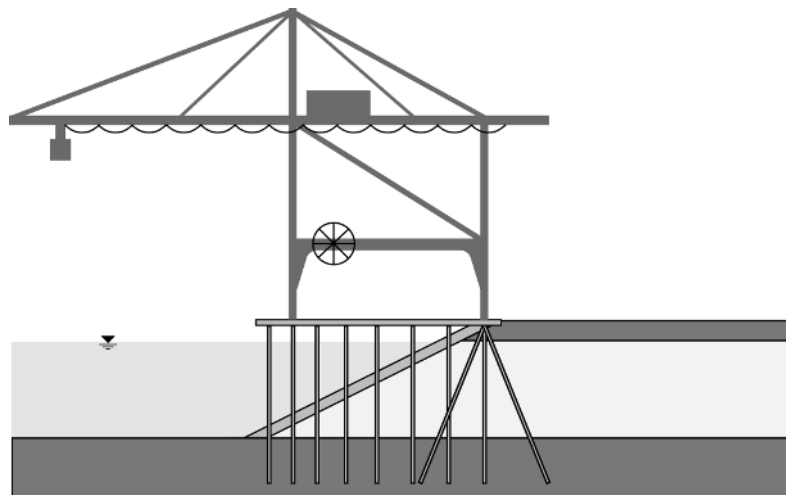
Soil-foundation-structure system for pile supported wharf (not to scale)
